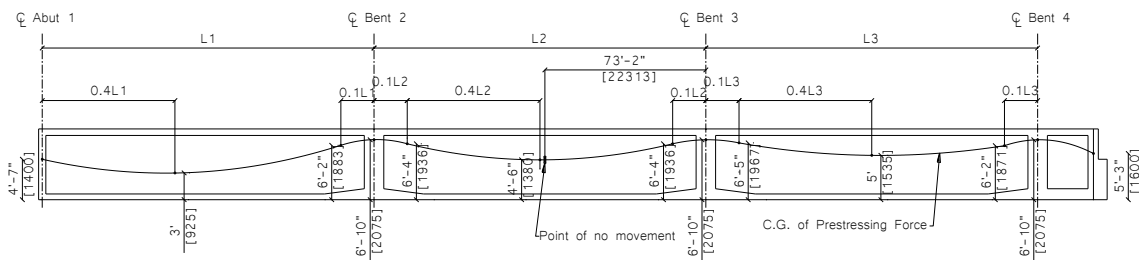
Prestressing tendons profile in Frame 1, Bridge 3
